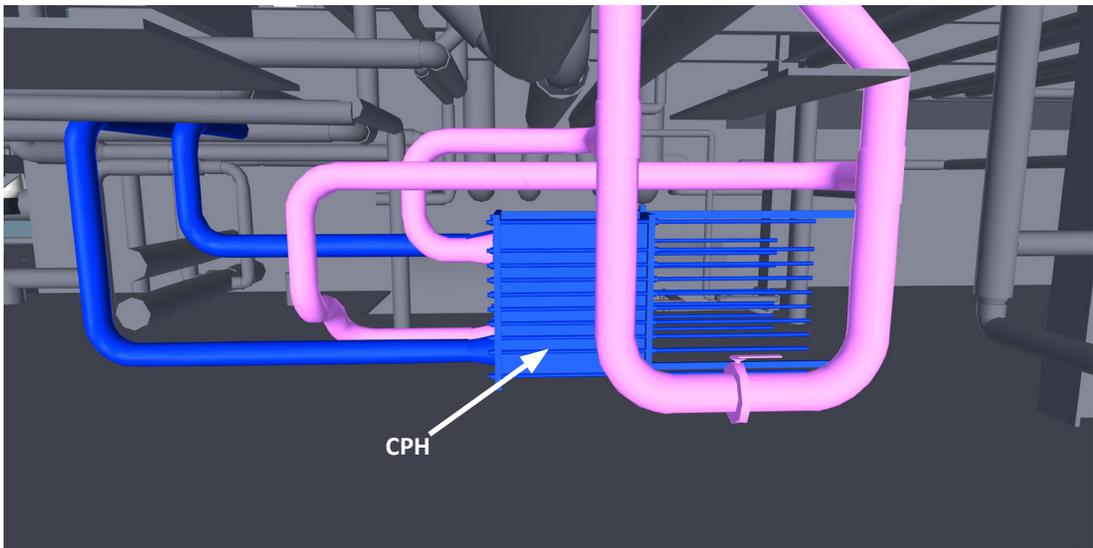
proposed design and location of CPH 1 and associated piping (highlighted in blue with some existing piping and steel hidden)
